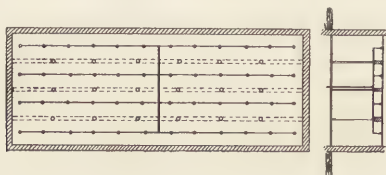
DISTRIBUTION OF AUTOMATIC SPRINKLER IN PLAN AND ELEVATION
